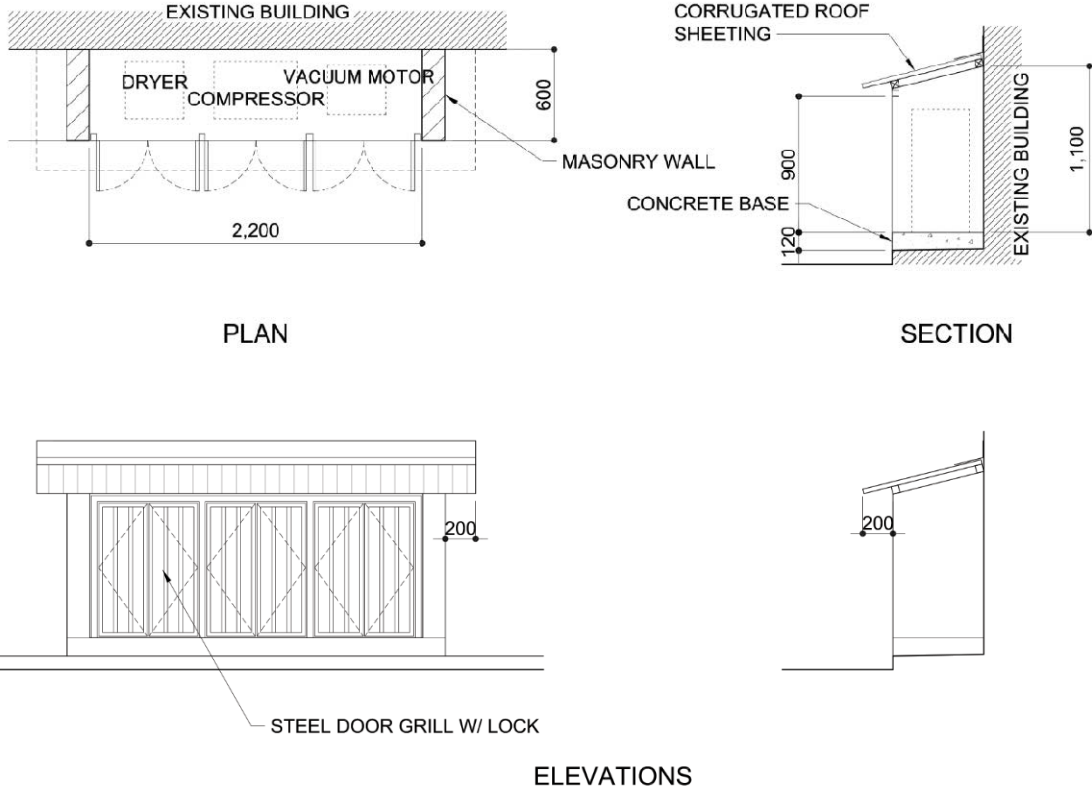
Draft Drawings of Compressor Shed for Dental Unit
